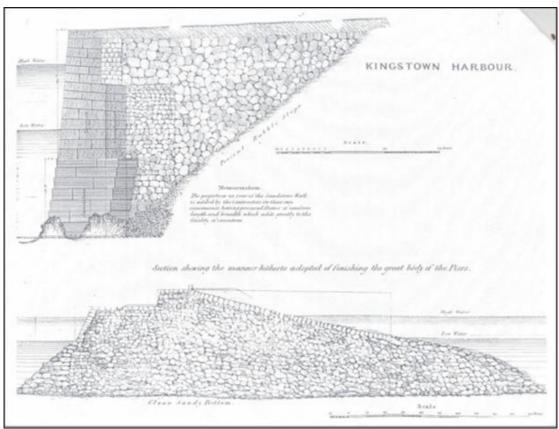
Cross Sections through the pier and wharf walls indicating their build-up and structure. The bottom section is an 'as built' record prepared by Board of Works, the top section shows proposed construction for pier ends. SOURCE: OPW Library
